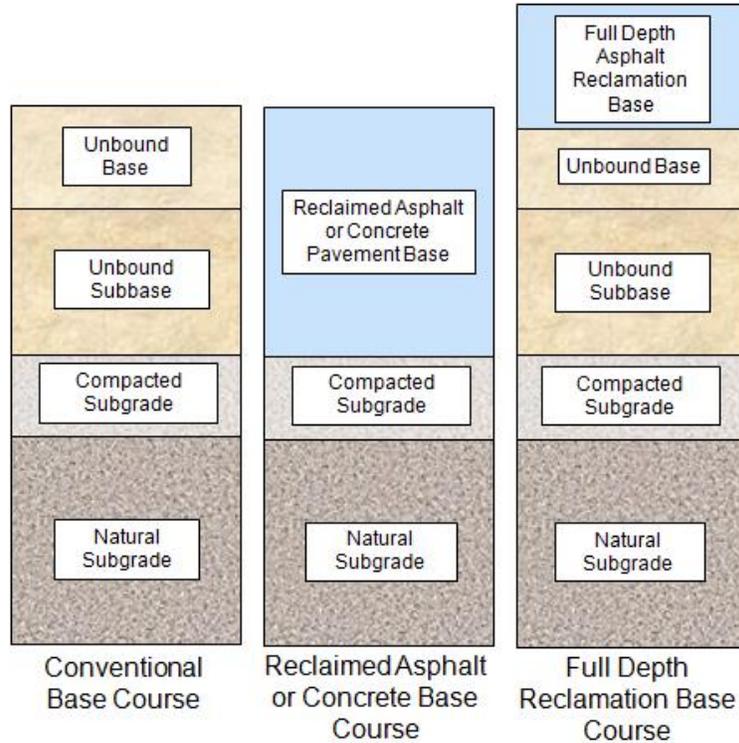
Reclaimed Asphalt and Concrete Pavement Base Layers
